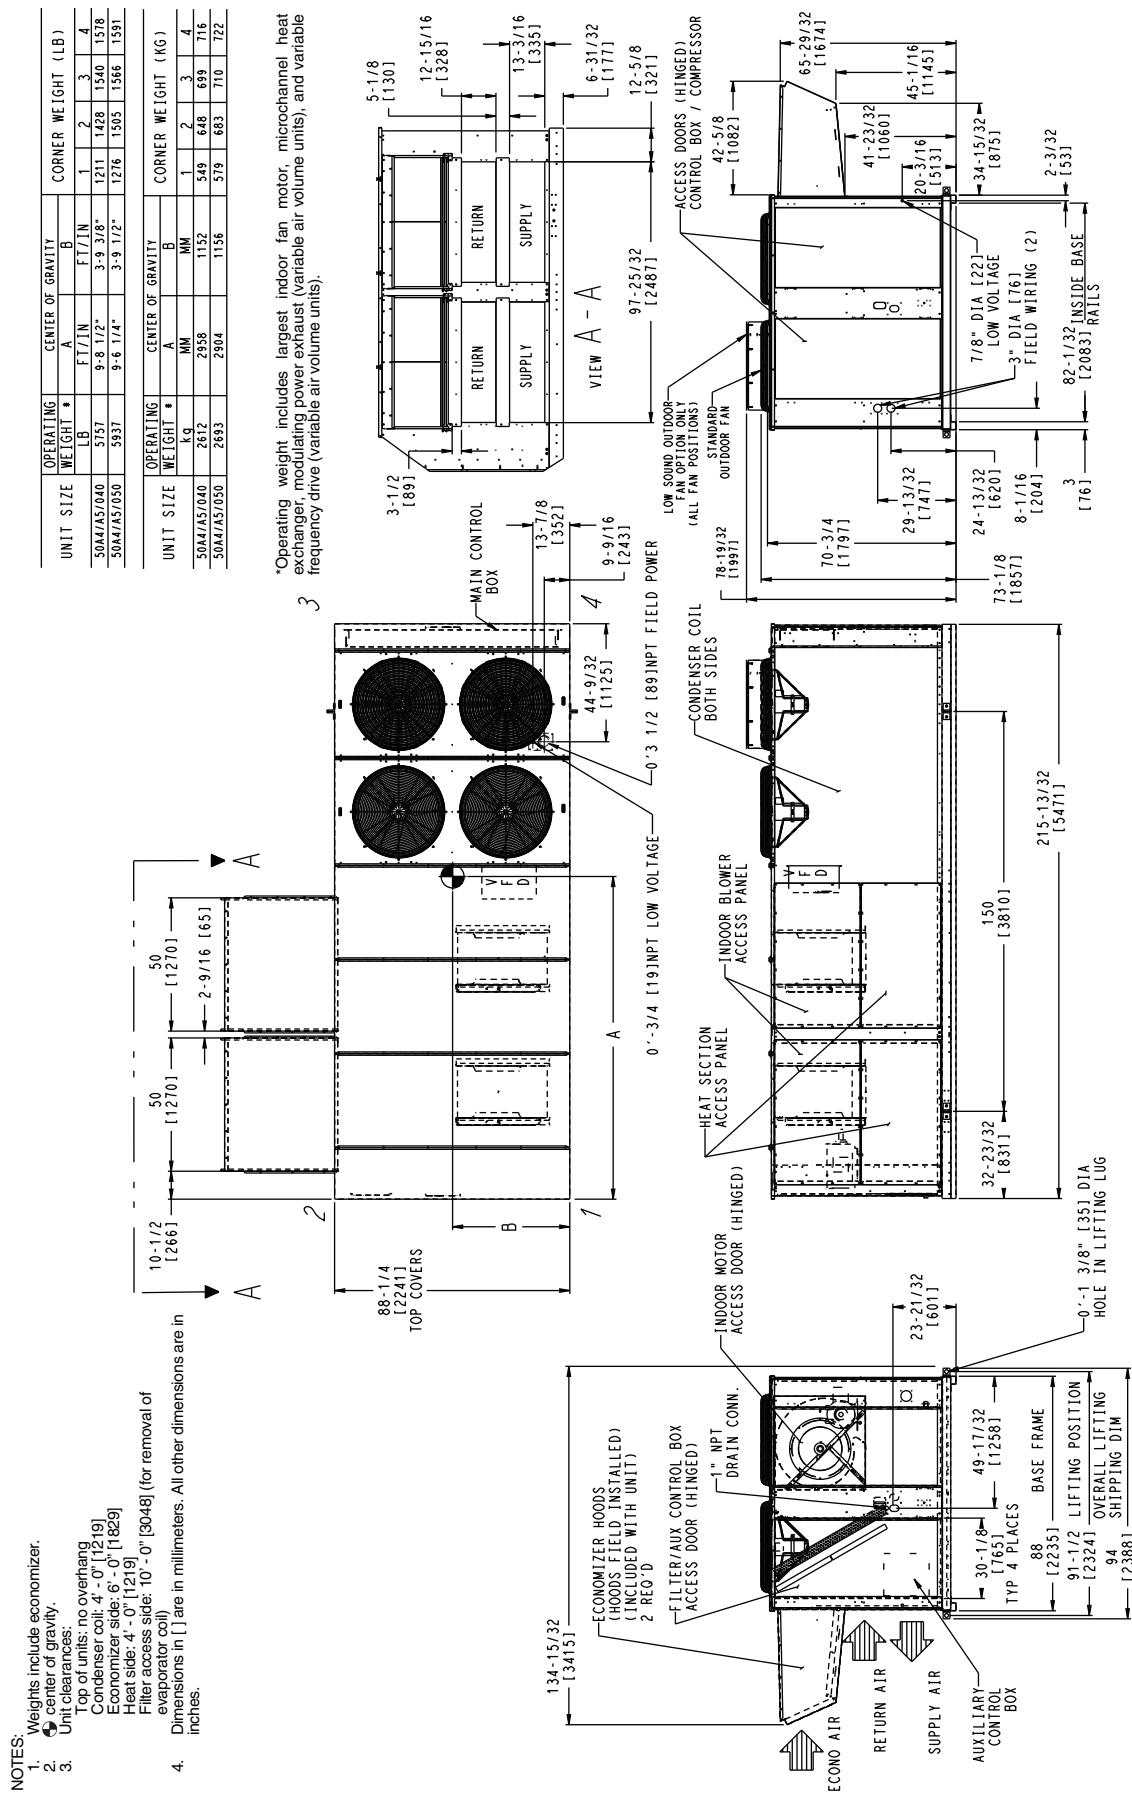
Base Unit Dimensions — 50A4,A5040-050
